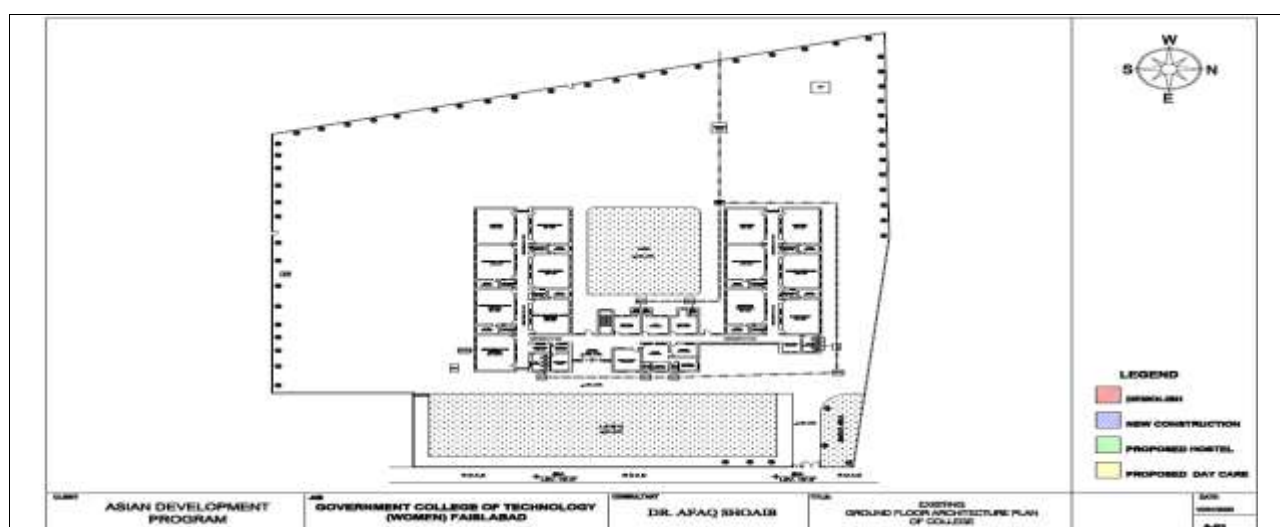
Existing Layout of Government College of Technology (Women), Peoples Colony, Faisalabad (T-1).
